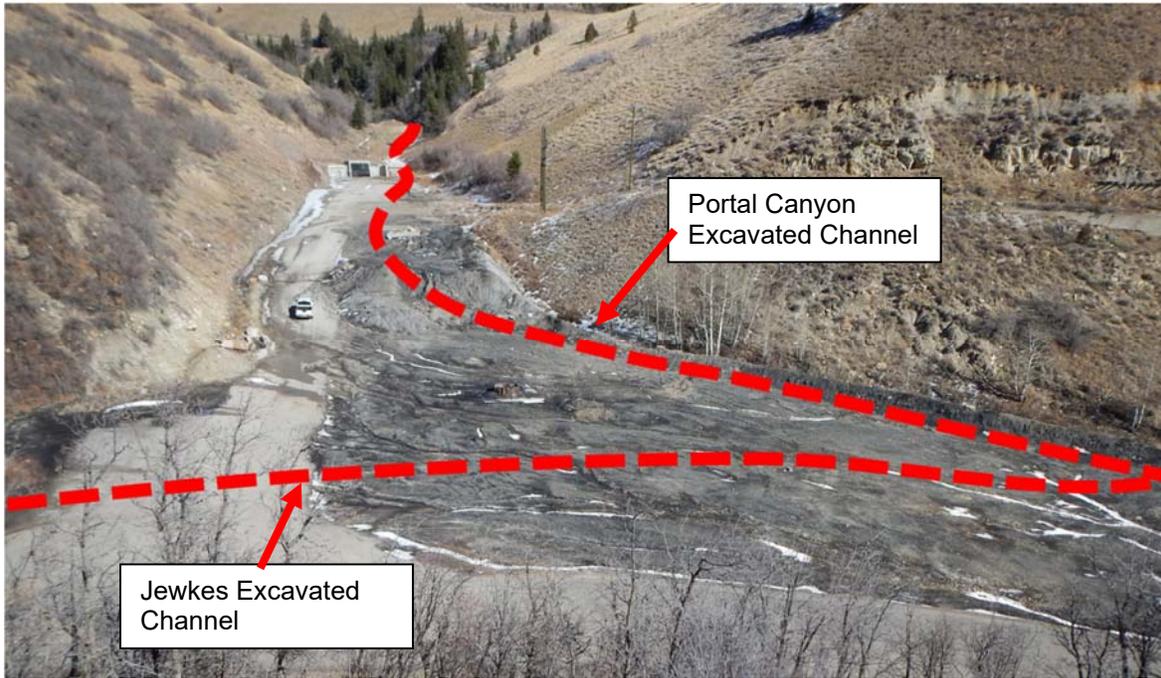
Excavated location of Jewkes and Portal Canyon channels. Portal Canyon channel excavation shall run down the center of the canyon then curve to the east to run along the eastern boundary of the disturbance. Jewkes channel shall run through the center of the lower pad curving around the metal silo.
